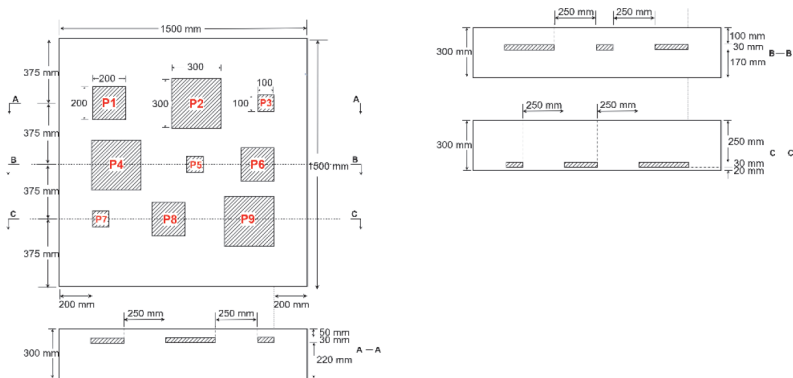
Geometric layout and cross-sectional views of embedded defects
